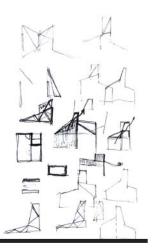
Workshop elevation and stack ventilation chimney shape
